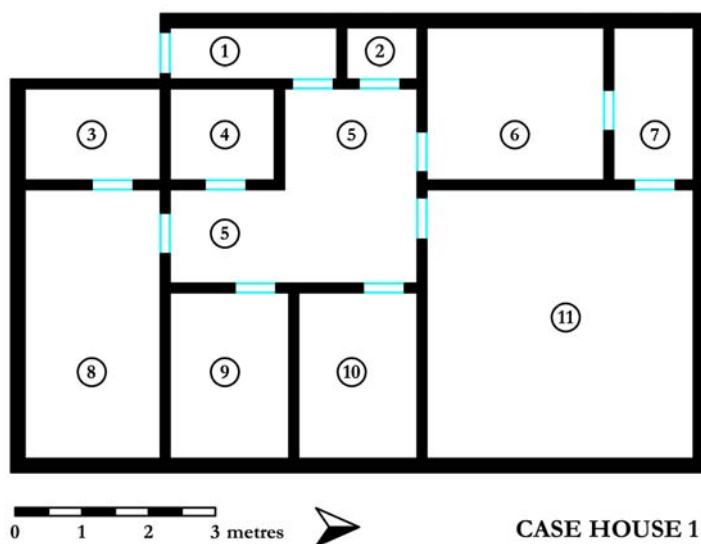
Plan of my apartment in Istanbul, Turkey; Case House 1.
